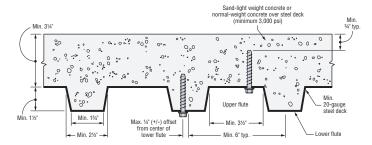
Installation of 1/4"-Diameter Anchors in the Soffit of Concrete over Steel Deck
